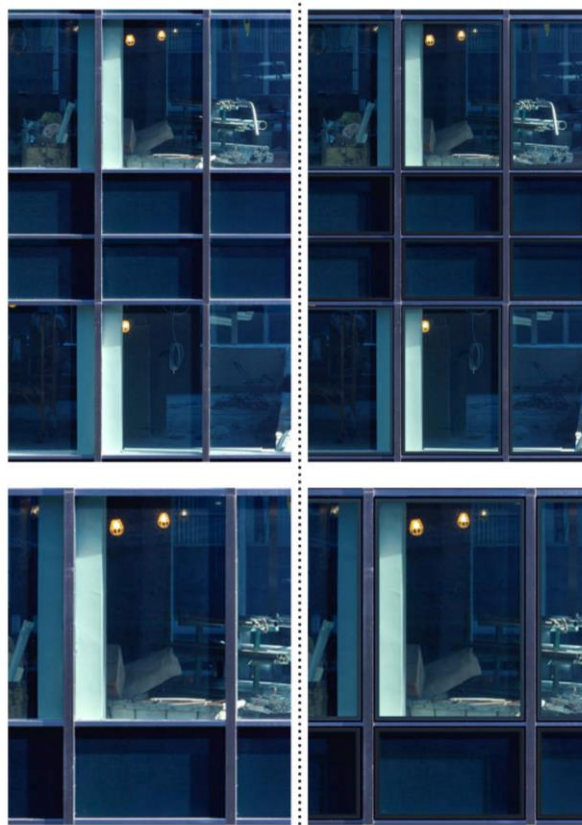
A partial facade view of Lever House showing the existing curtainwall (Left) and Opt 1 intervention scenario (right). (Image courtesy of SOM, edited by the author)
